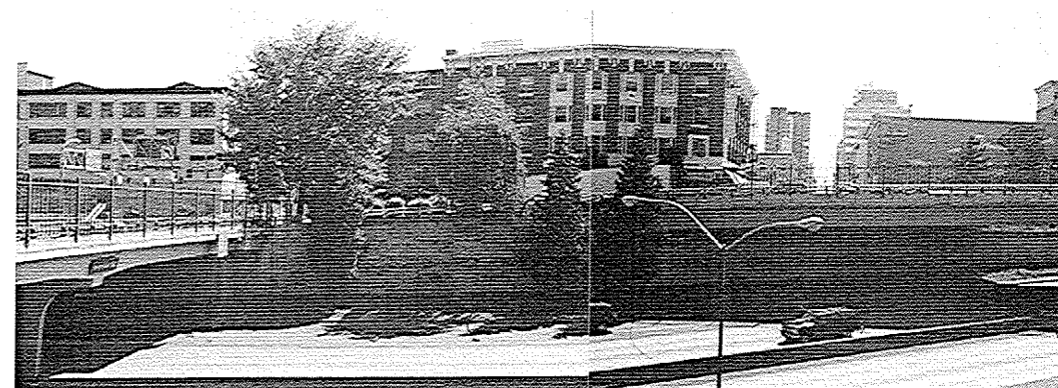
Site photo, on the Washington Street axis at 15th, looking east down Washington.
